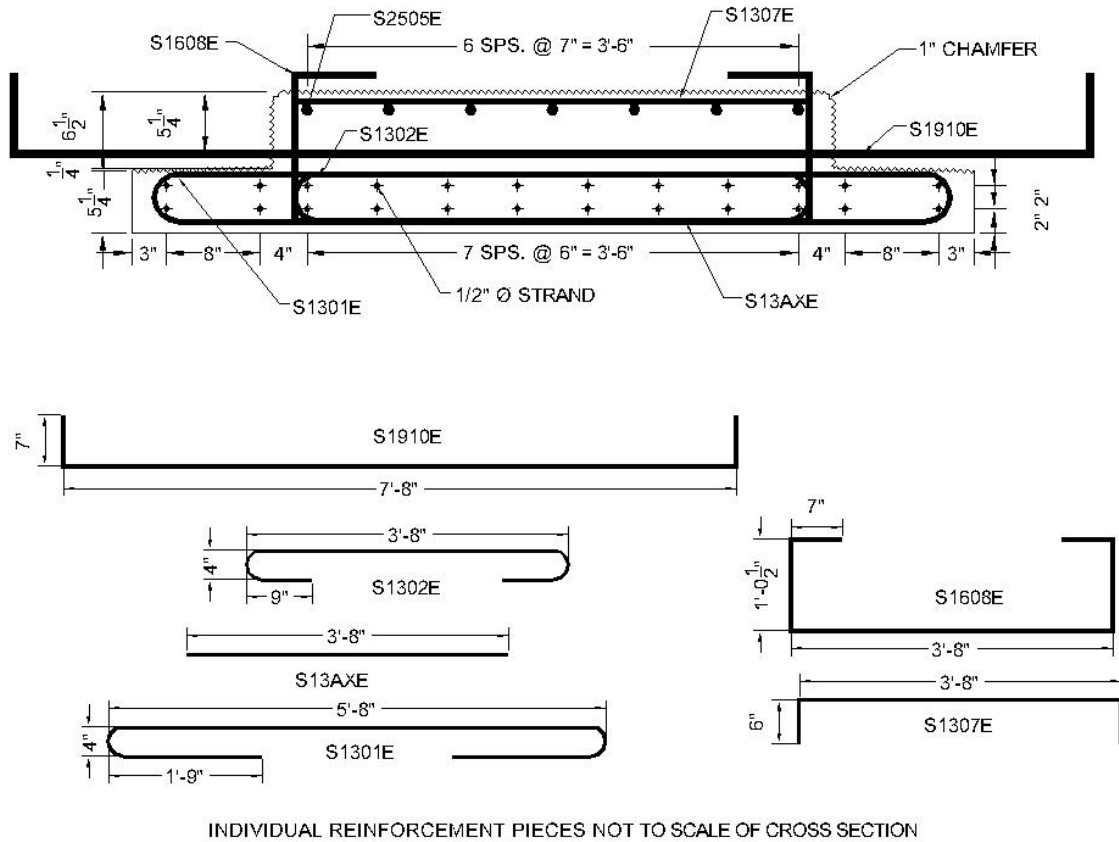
Cross section and individual reinforcement details for east end of precast beam 2S
